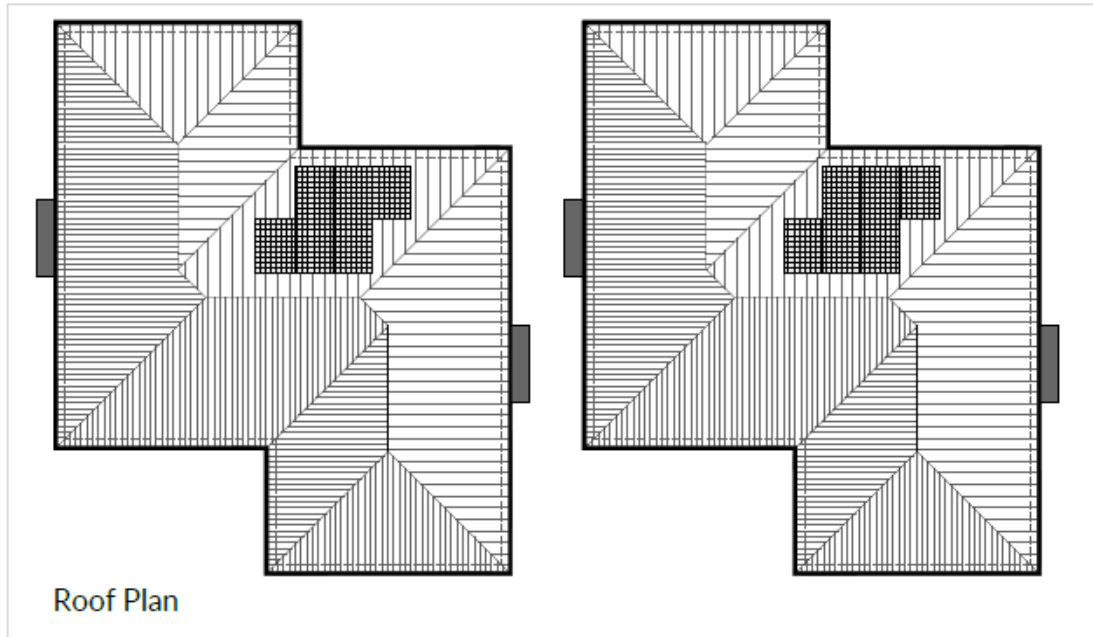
ROOF PLAN (DRAWING NO. 23.53.PL06)
